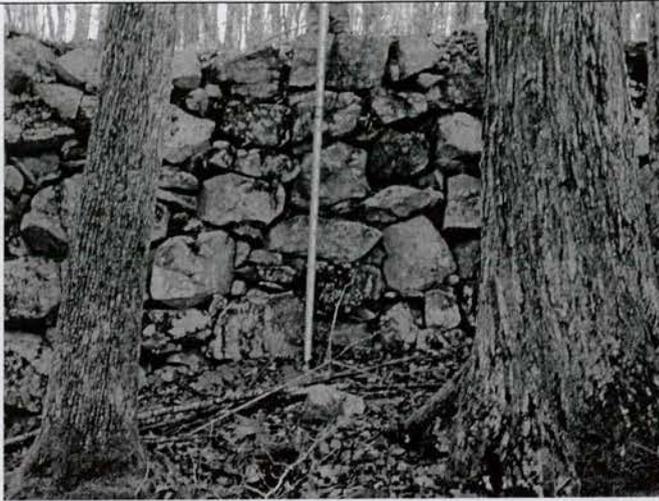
35-12-1-2005 London Bridge W wall, North to South, Section 6B View E
